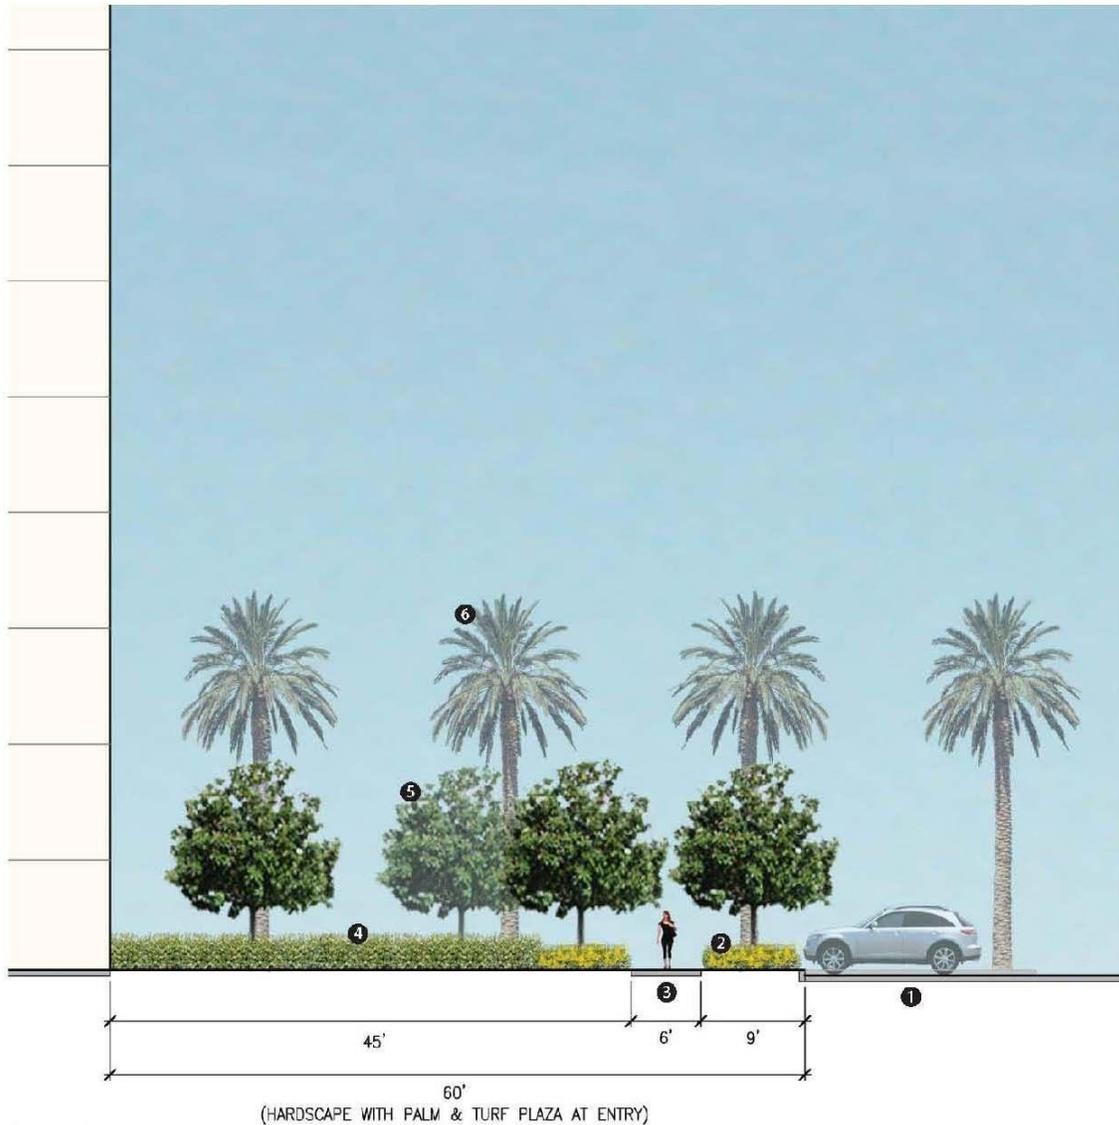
5-8 Story Office Building Front Facade
